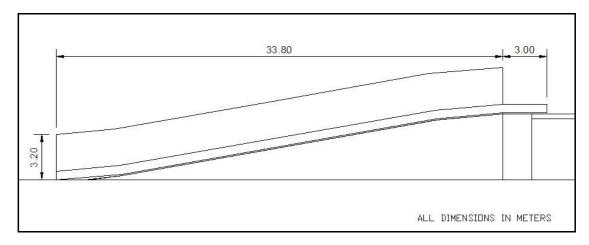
Side View Crossing Junction Access Rail Dimensions
